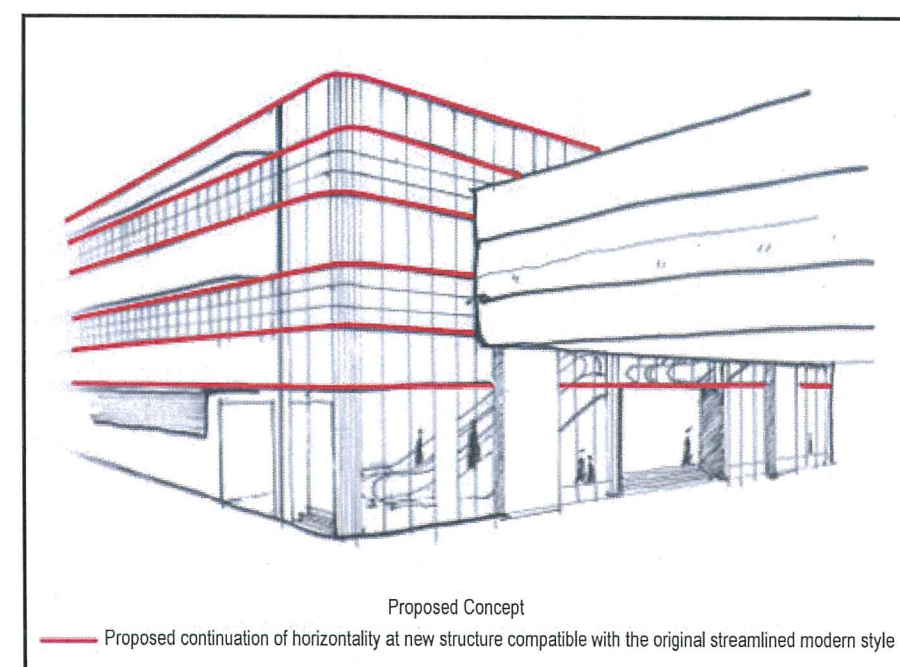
Conceptual Design of the New Facade facing DVRC in planning application (No. A/H4/94)
